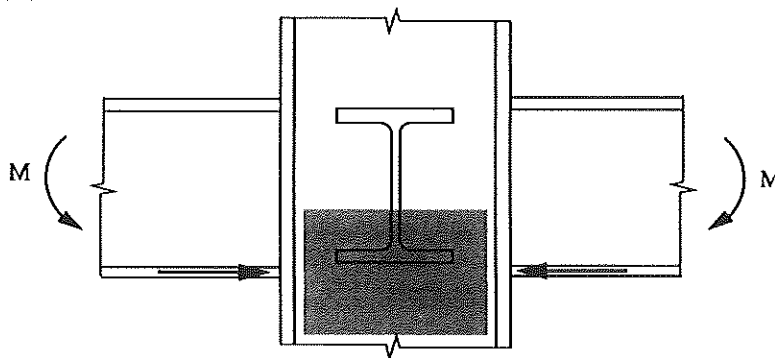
Loading case of a 3-D joint. Local instability of the column web (shaded area) is influenced by the minor-axis joint force
